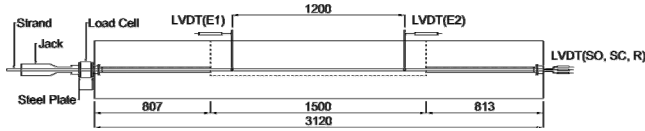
Test set-up and instrumentation for static load test (All units: mm)
